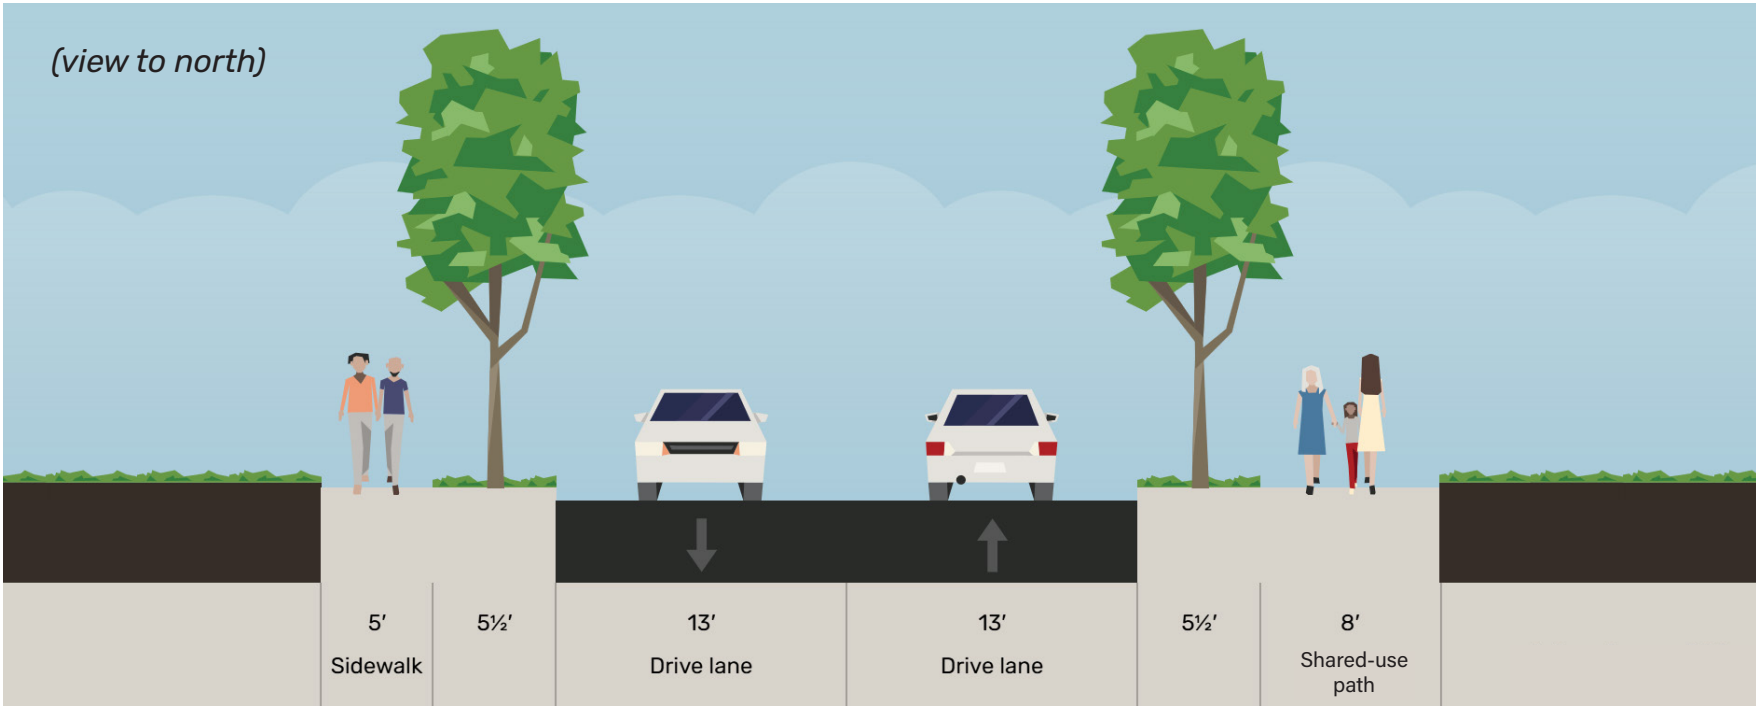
Proposed Typical Cross-Section on Meadows Drive (50' ROW)
